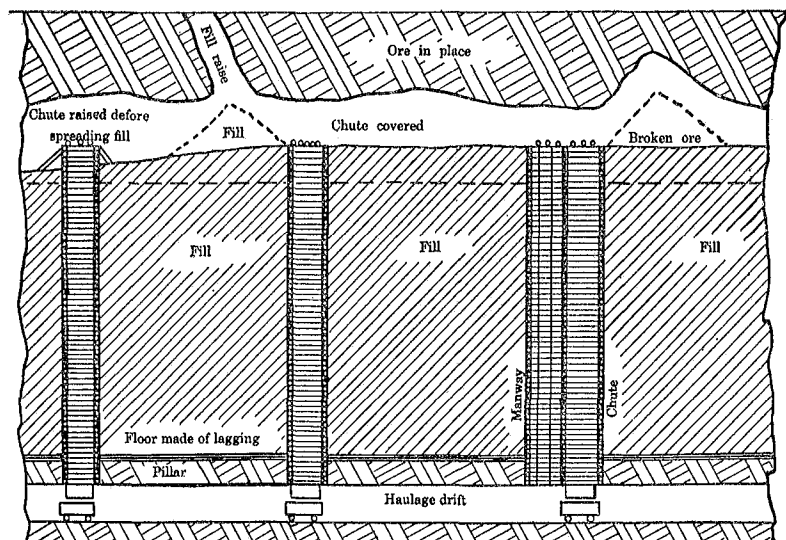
Typical cut-and-fill stope, Pilares mine.
